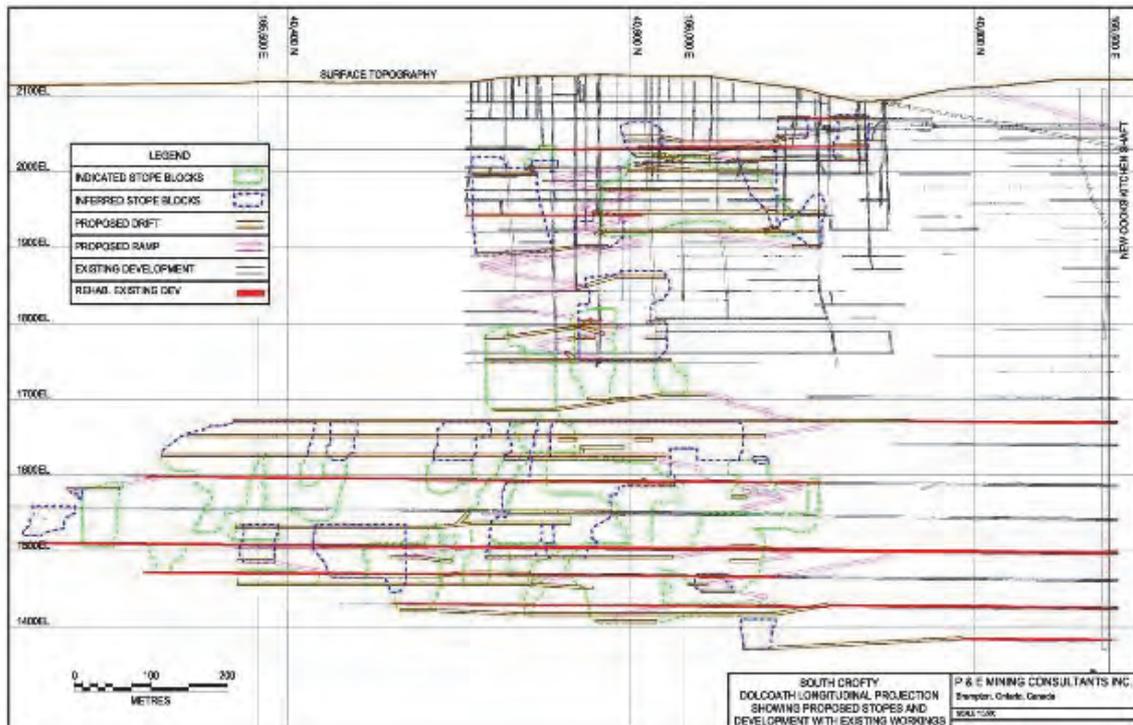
Longitudinal Projection of the South Crofty Dolcoath Section Underground Mine
